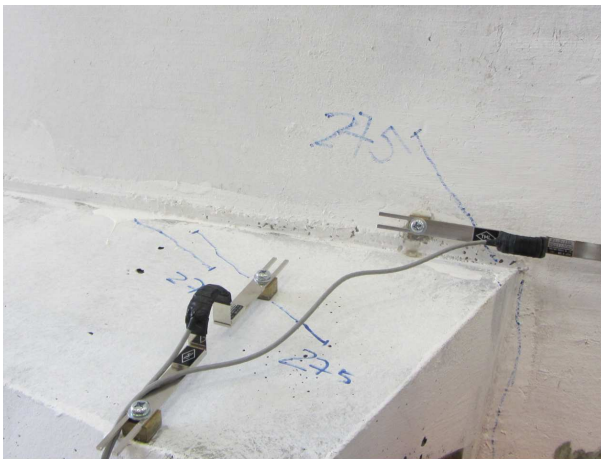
Cracking on the anchorage blister at the eleventh load step
